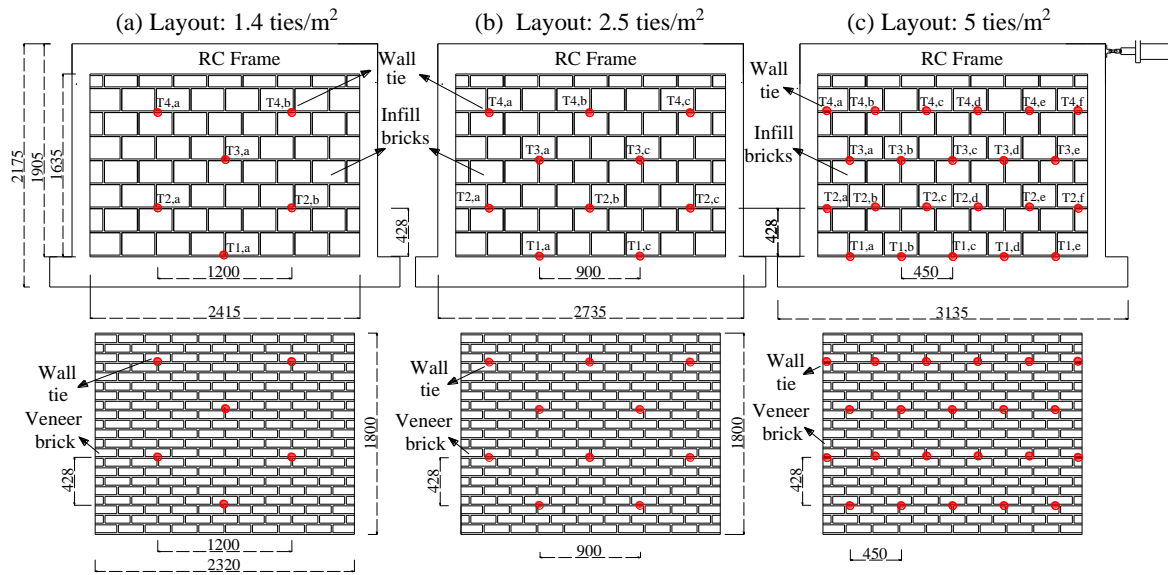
Layout of wall ties on masonry infill and veneer wythes (dimensions in millimetres)
